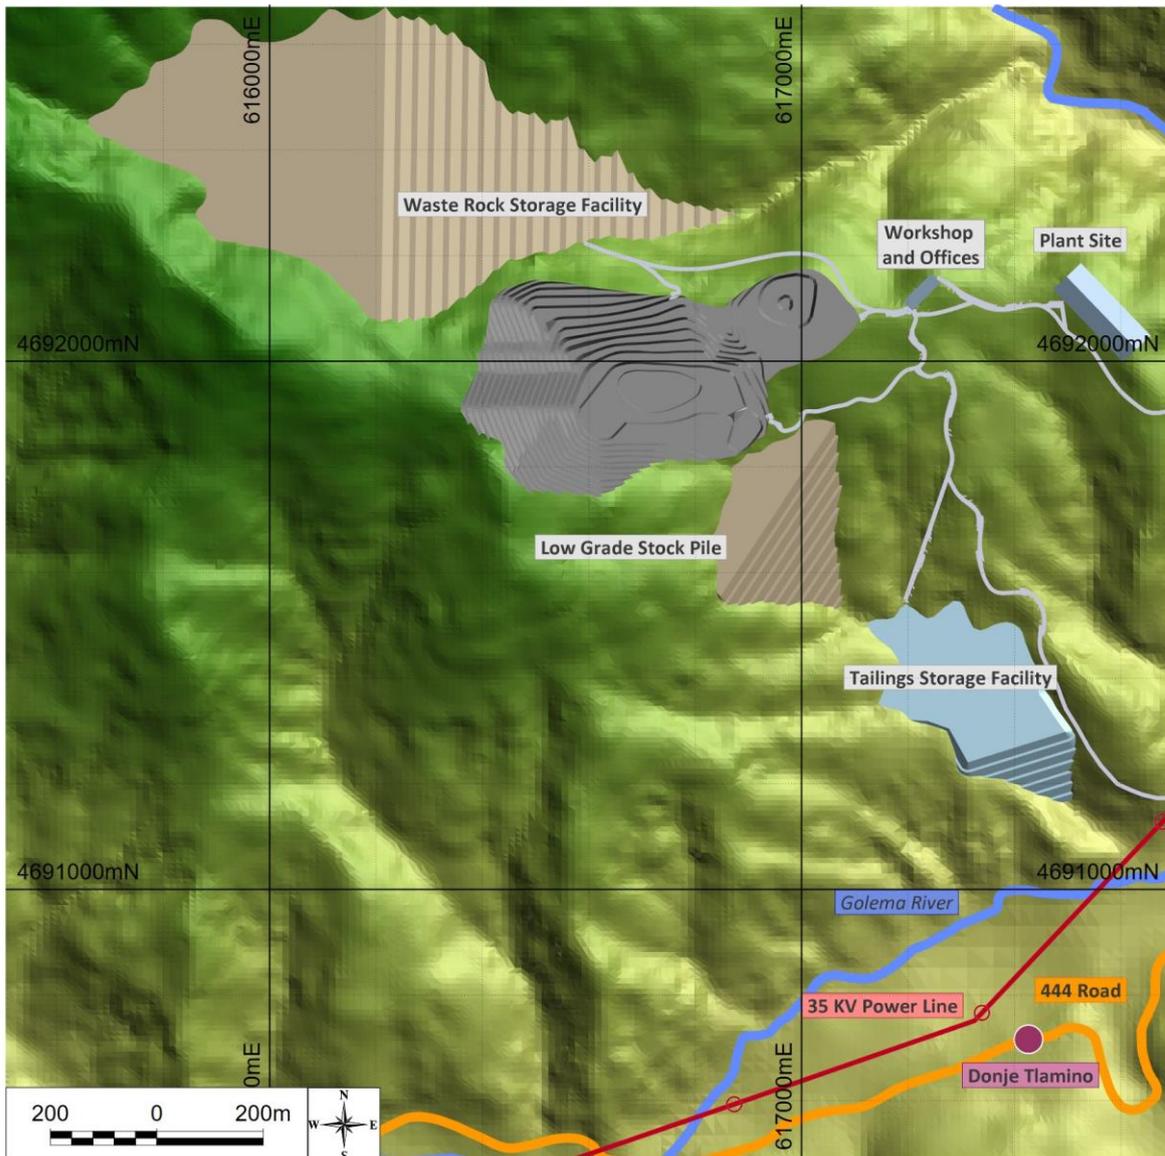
Plan View of Pit Limit and location of the WRSF and LG Stockpile
